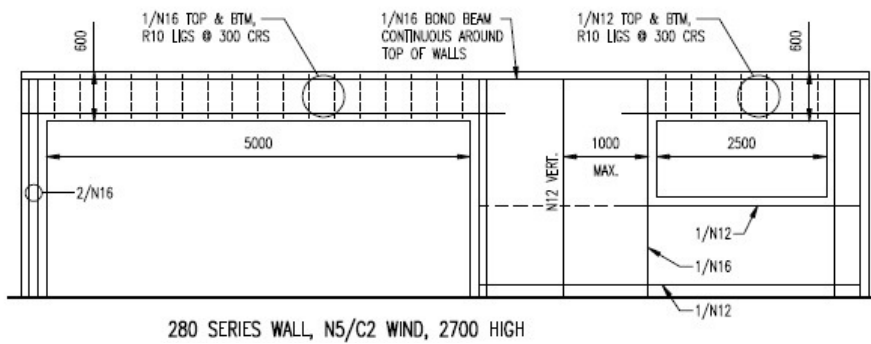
2700 High Wall, N5/C2 Wind Rating, 280 Series ECO-Block (Max. roof load width: 7.2m)
